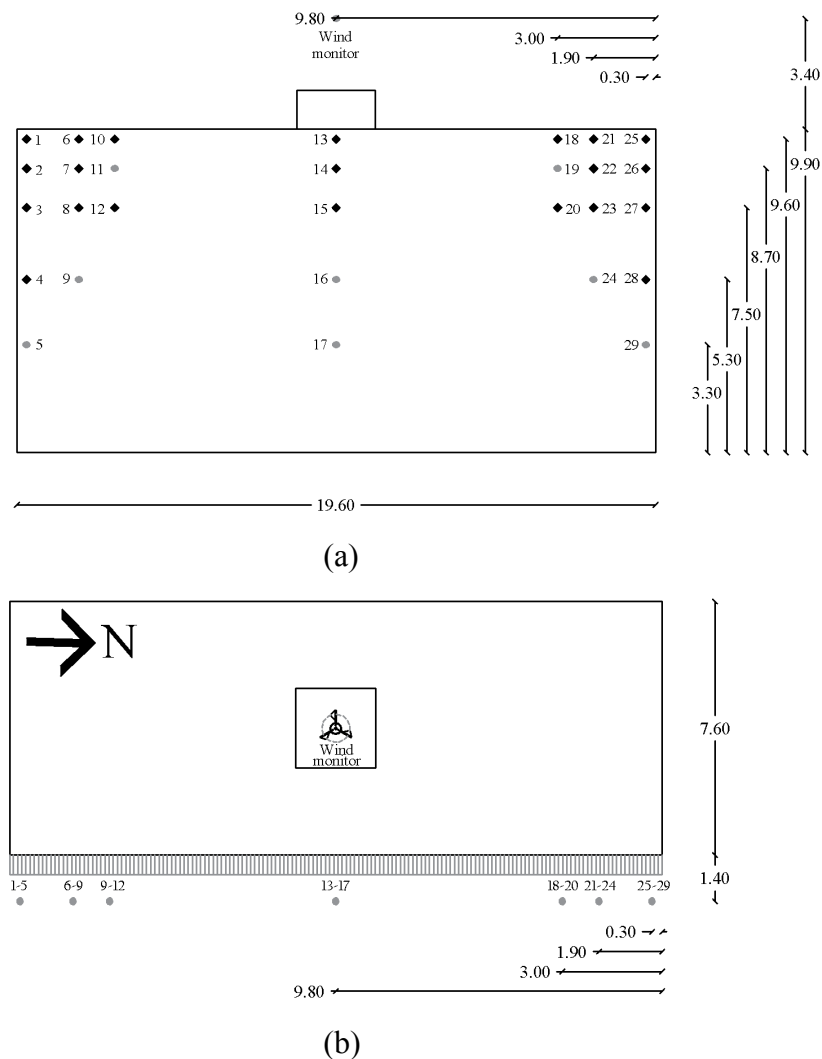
East elevation (a) and top view (b) of the Cassiar building model with 1.2 m overhang (scale 1:200). The measurement points near the east facade are shown in addition to the wind monitor location. All values are in cm.
